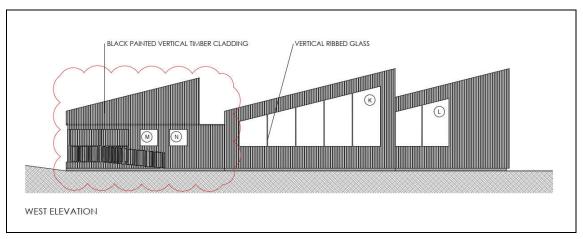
As Built Gym West Elevation - 16/02572/NMA
